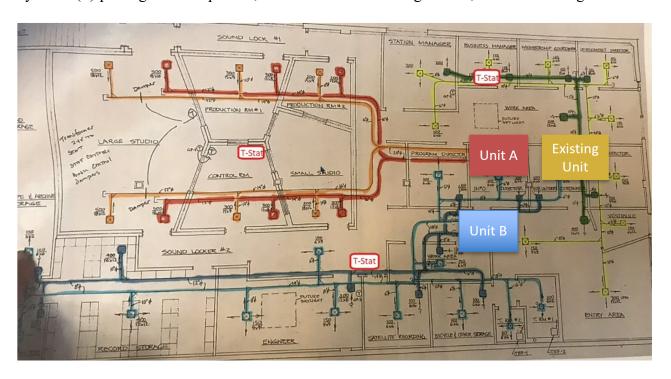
KBOO HVAC SYSTEM LAYOUT
